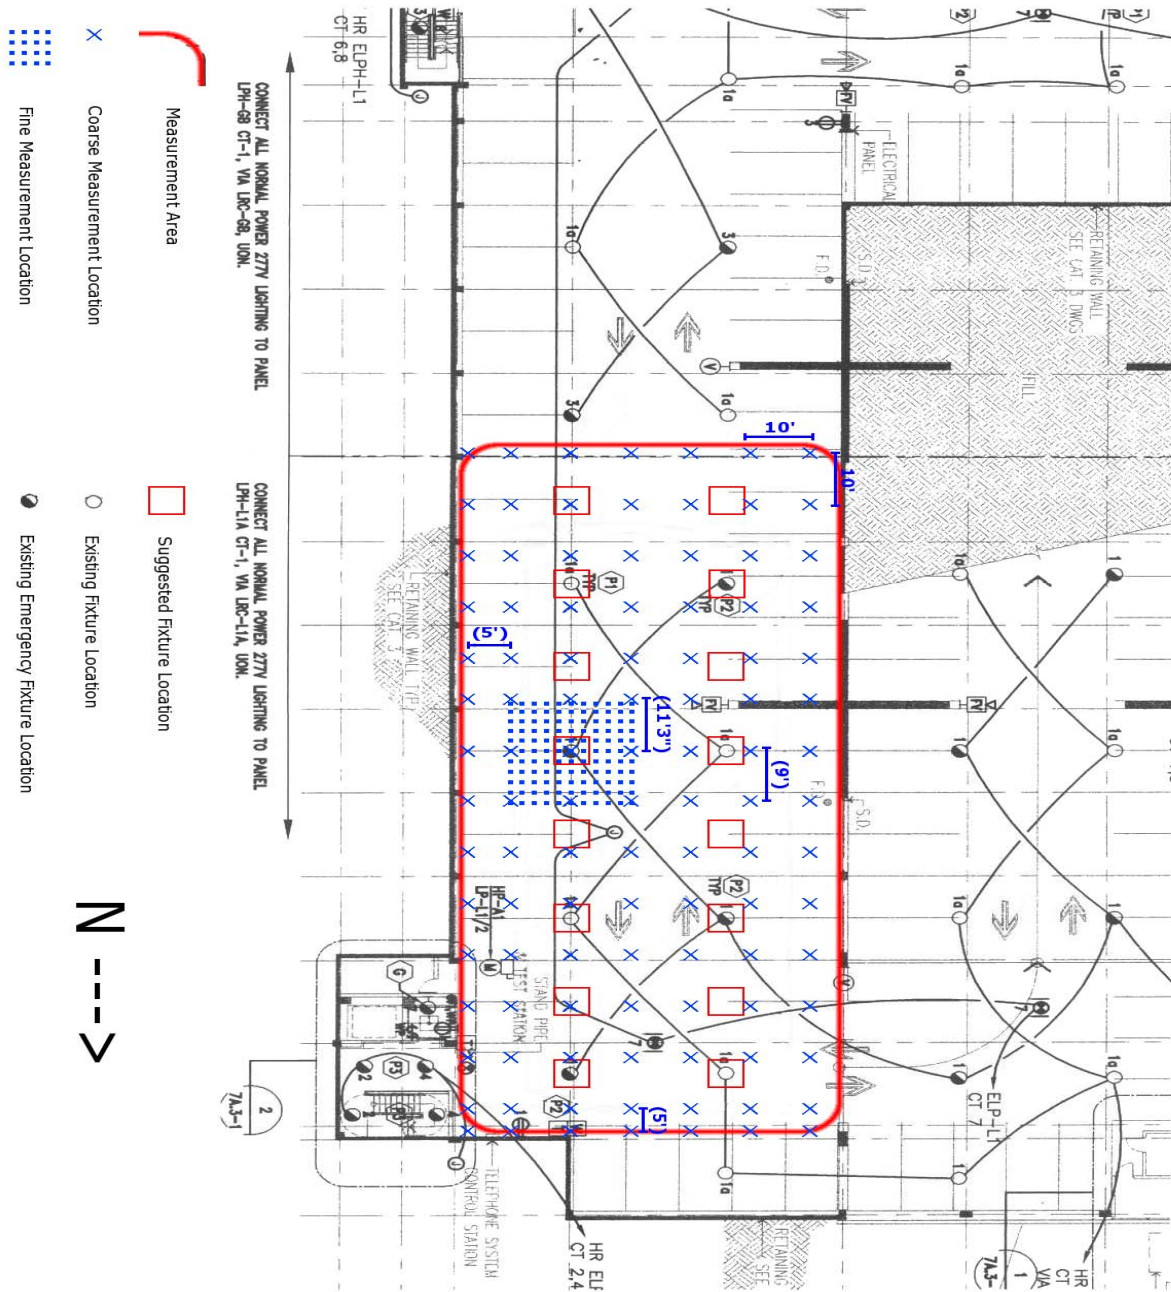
Floor-Plan and Measurement Layout of Testing Area.
